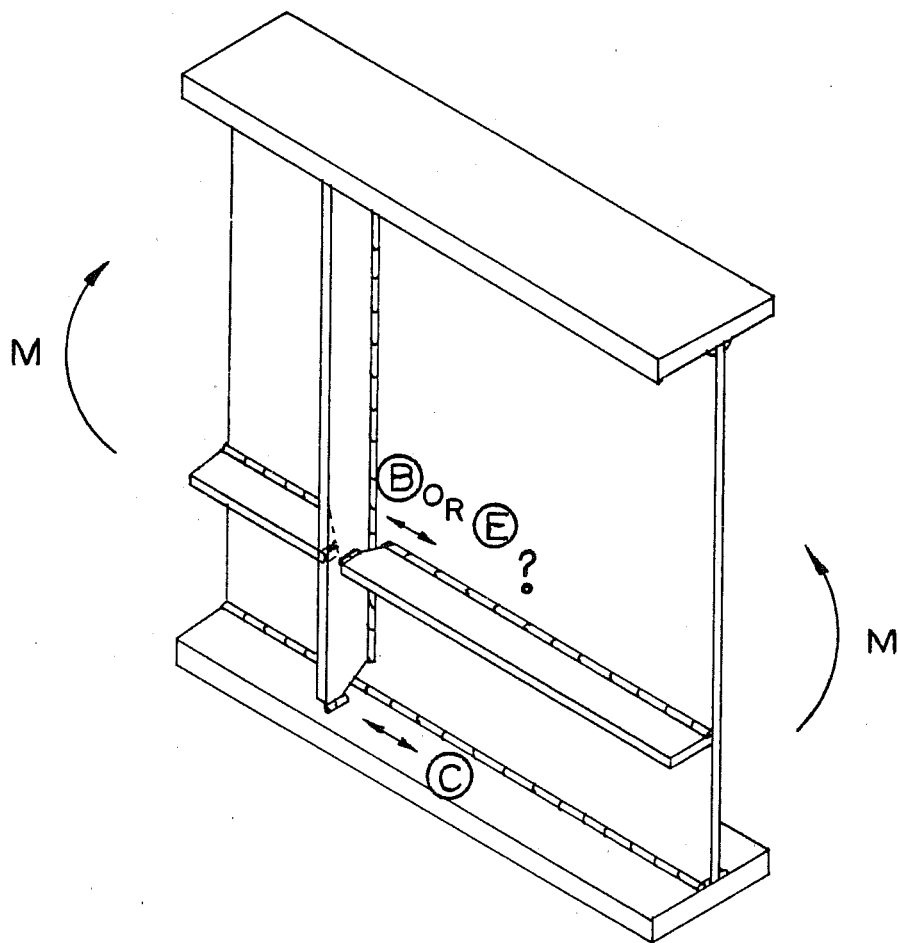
Cope detail in which transverse and longitudinal stiffeners are welded together
